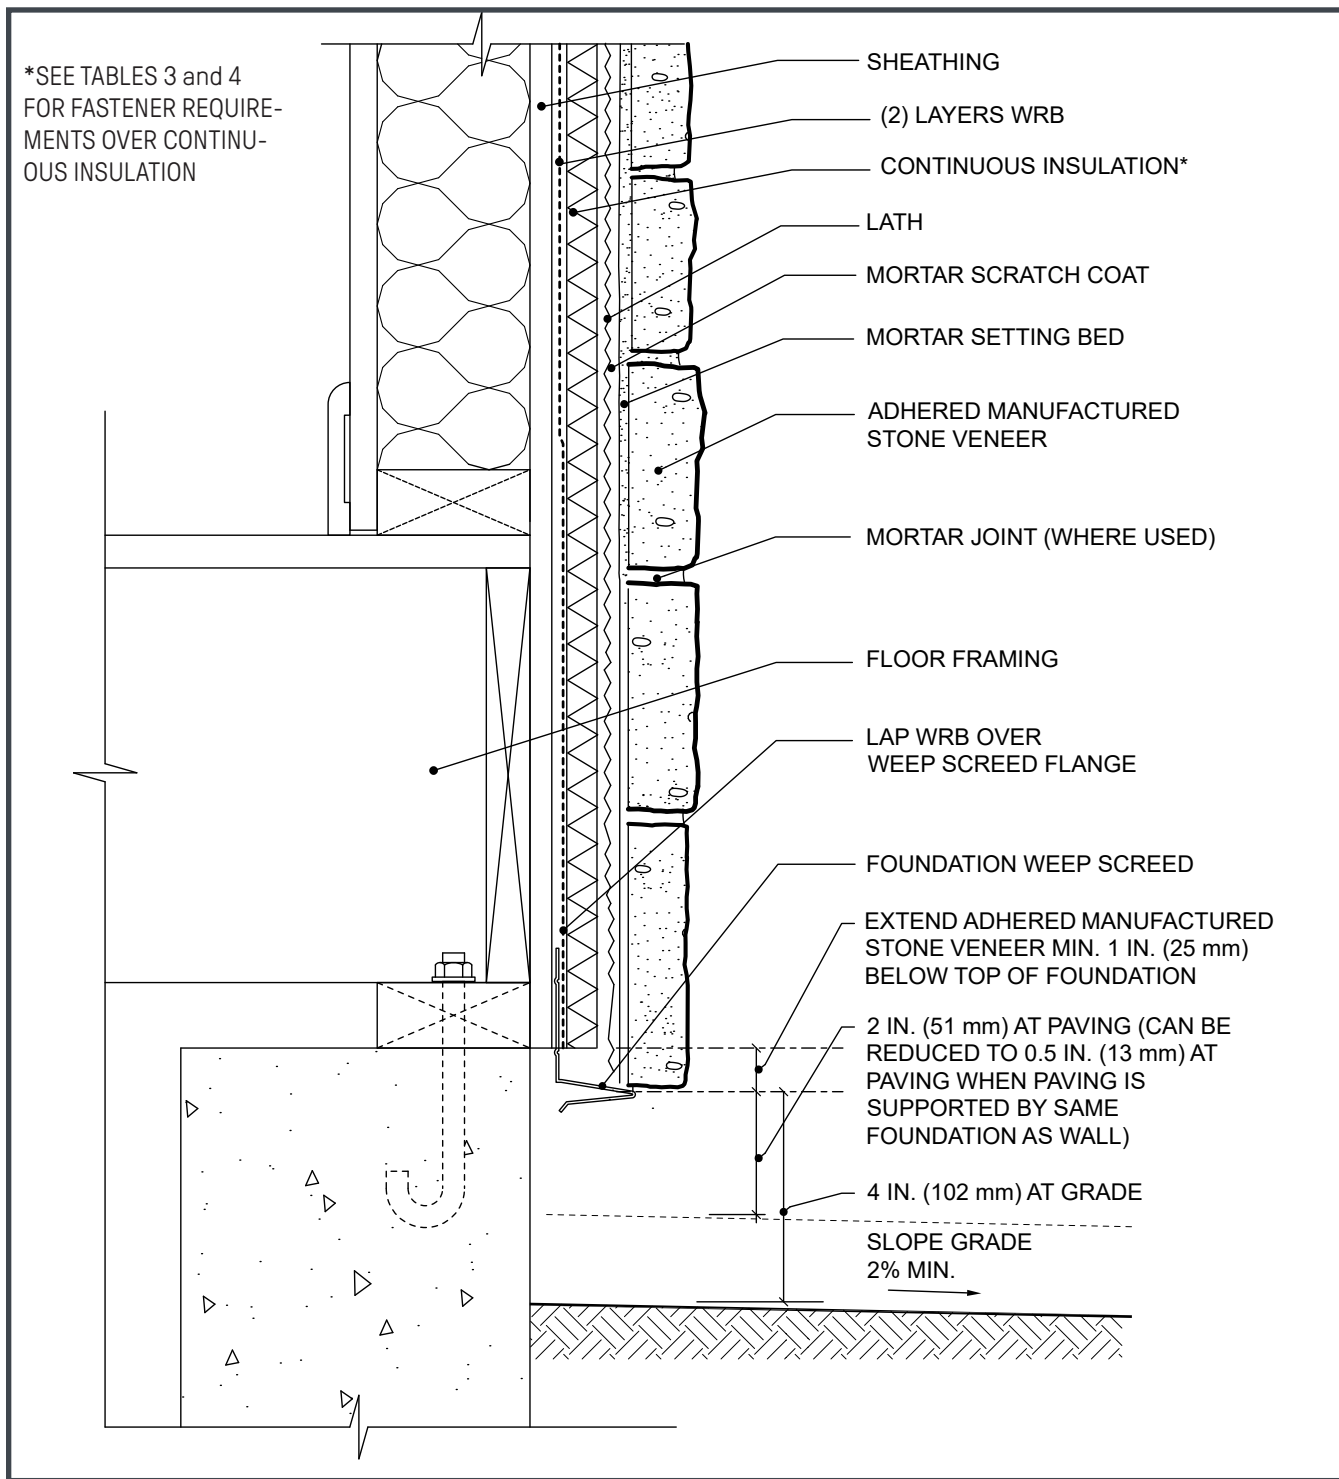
Foundation Wall Base - AMSV Overlapping Foundation
